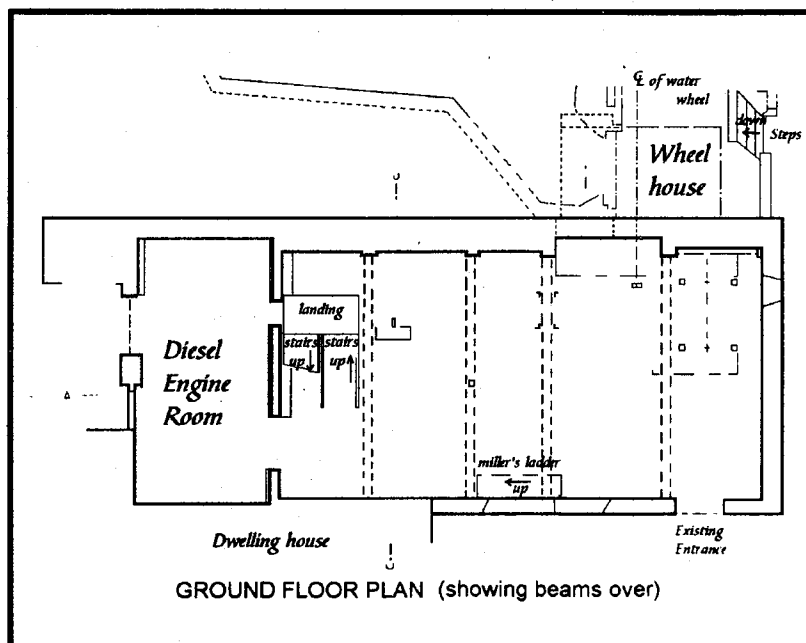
The contract plan of 1972 shows the greater thickness of the walls in the central part. This is accounted for by a new internal wall constructed to carry the beams supporting the milling floor when it was raised to a higher level.
